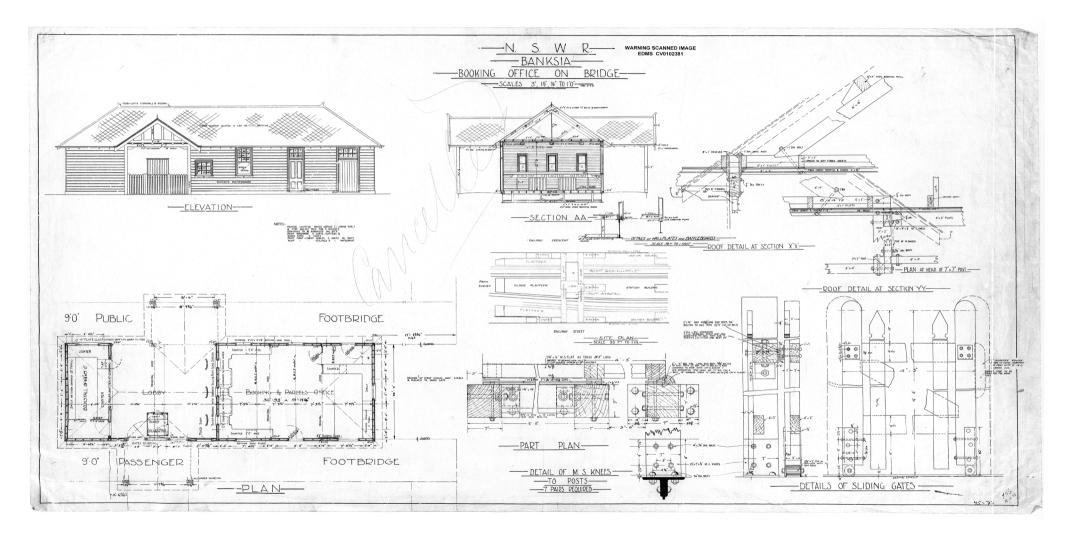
N.S.W.R Banksia Station plans – booking office on bridge (Source: Sydney Trains plan room)
